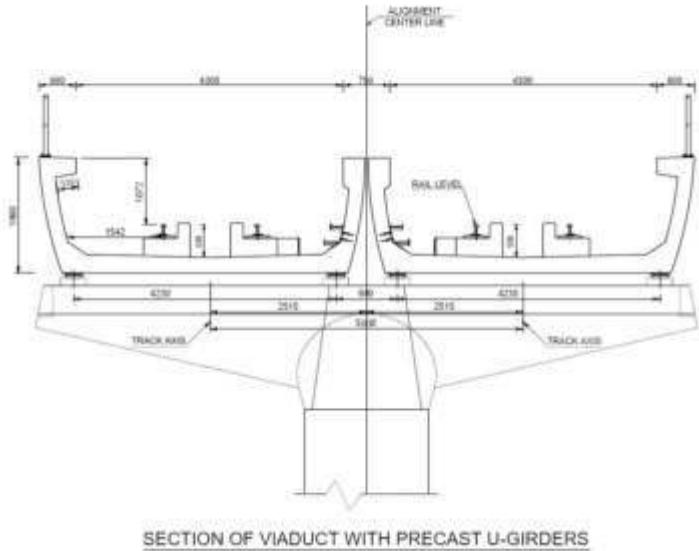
Details of the Pre-Cast U-Girders Highlighting the Height of the Parapet Wall above the Railhead
